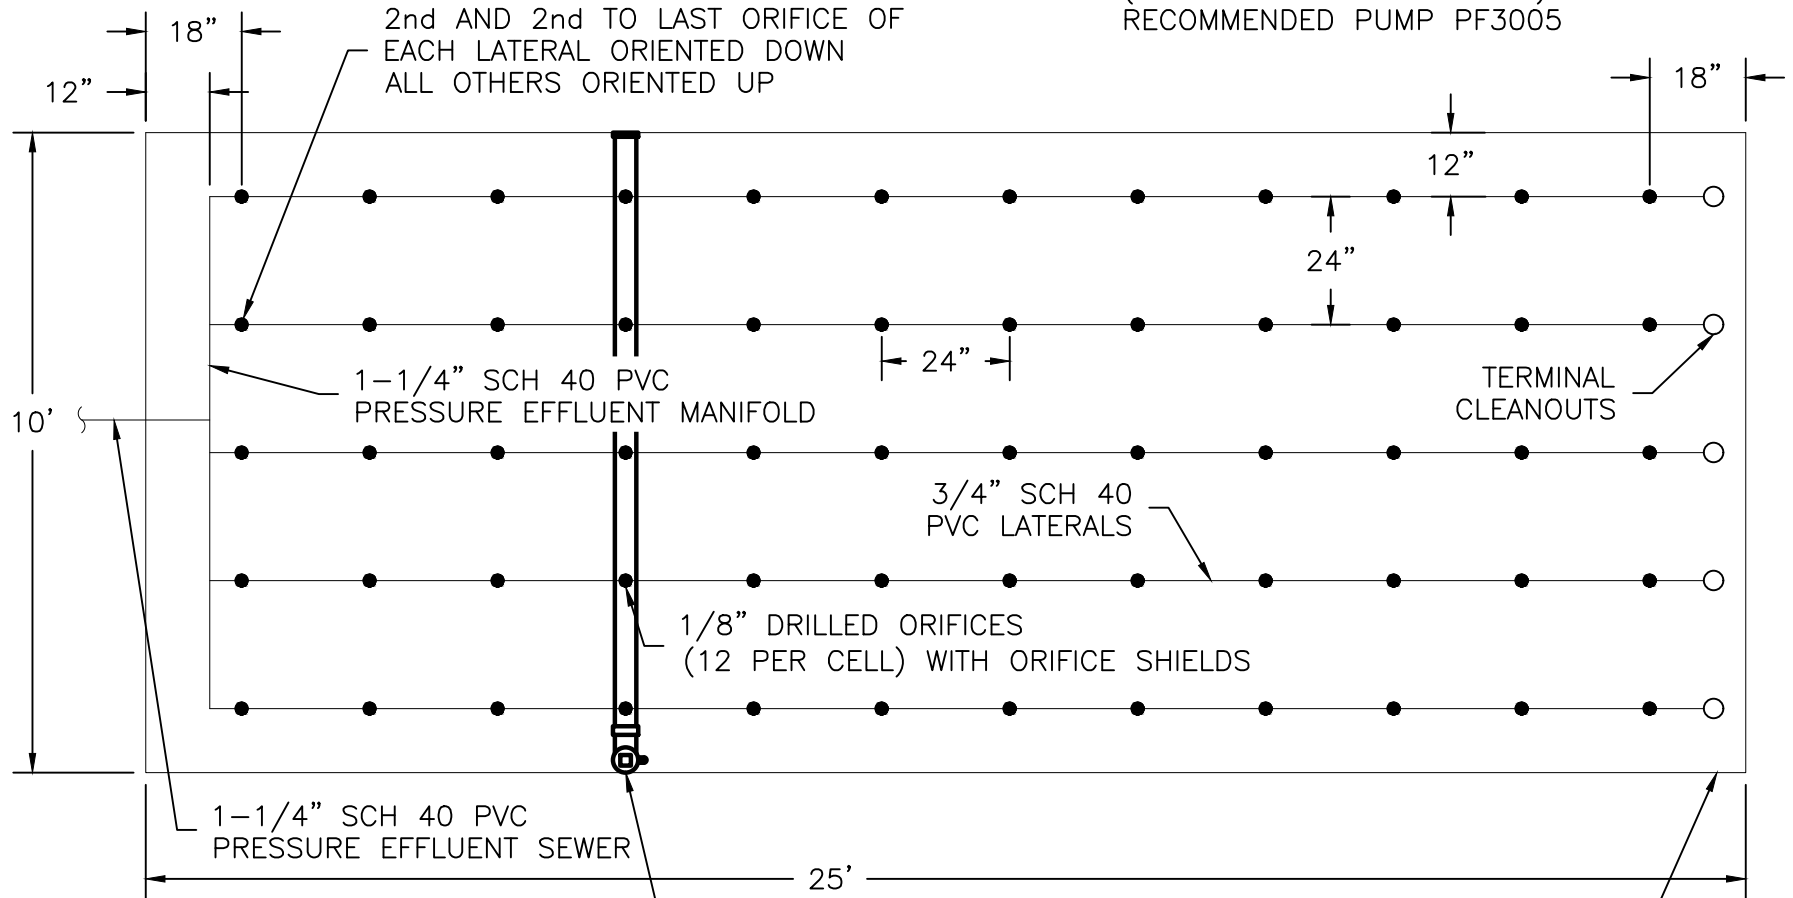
B. Modified Bottomless Sand Filter Section – Replacement
